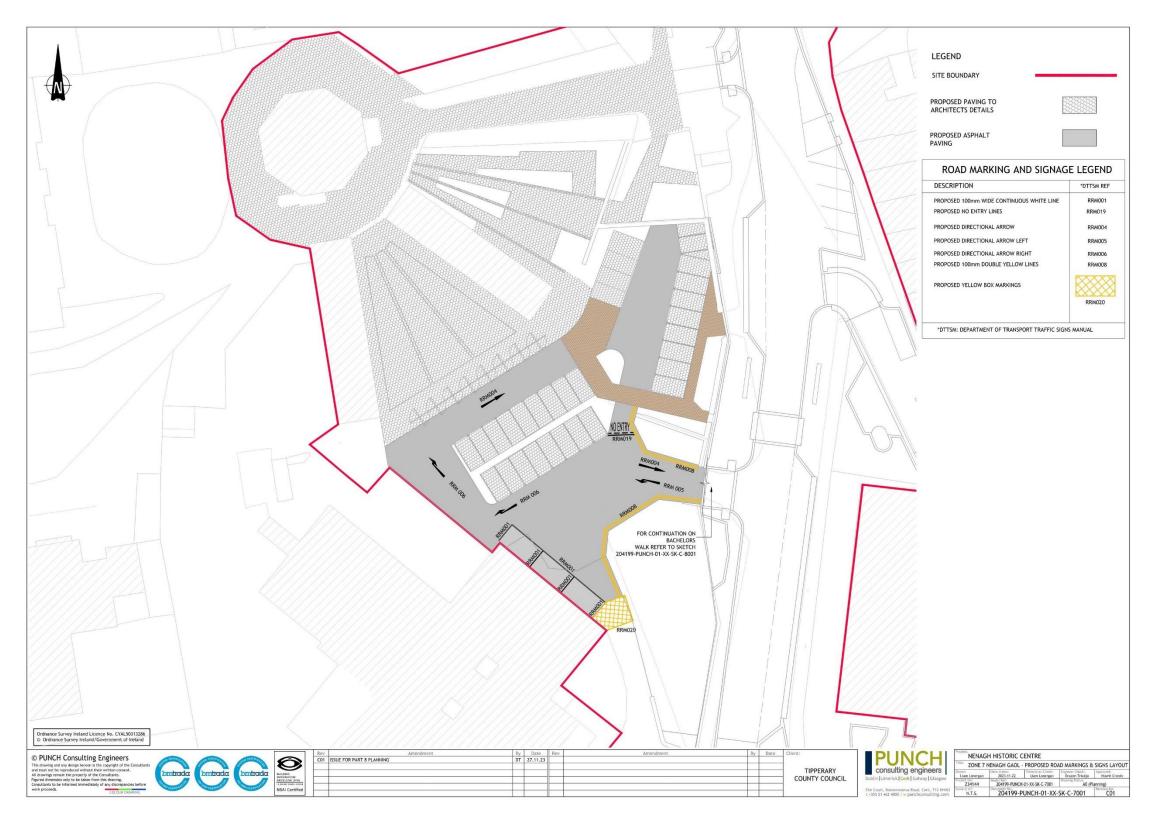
Proposed Road Design Gaol & Courthouse/Gaol carpark (NHCQ Zone 7)
